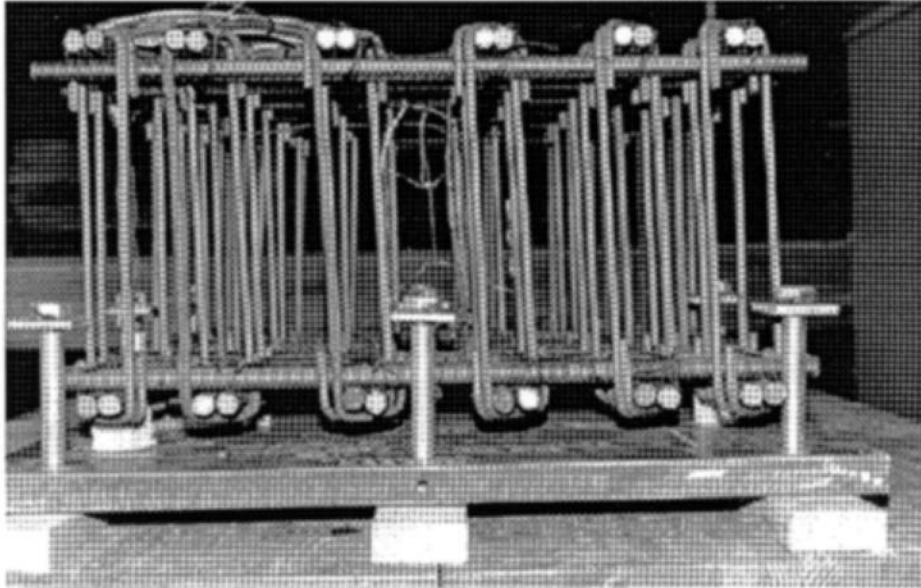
Inverted rebar cage in final stages of instrumentation installation. Note concrete embedment gage (#4) suspended in center of cage.
